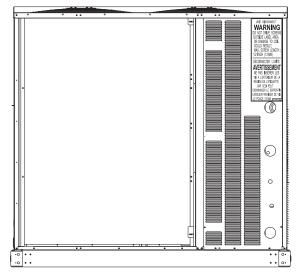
Mounting Position for Field Disconnects (up to 100A)
